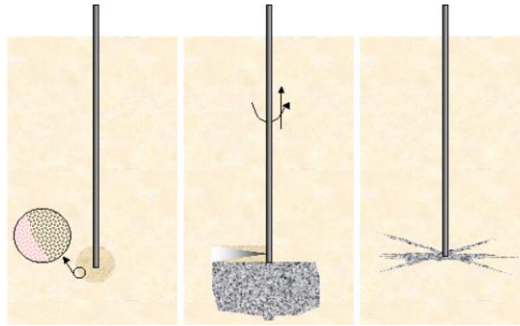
Soil improvements using permeation grouting (left), jet-grouting (middle) and fracturing (right) (de Jong, 2021).
